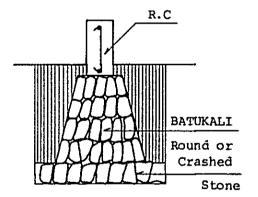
PROPOSED FOUNDATION SYSTEM
